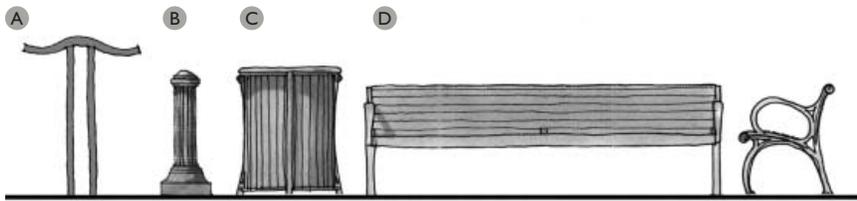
Examples of pedestrian amenities such as (a) bicycle racks, (b) bollards, (c) trash receptacles, and (d) benches that shall be designed to be durable and consistent with the street lighting fixtures.
